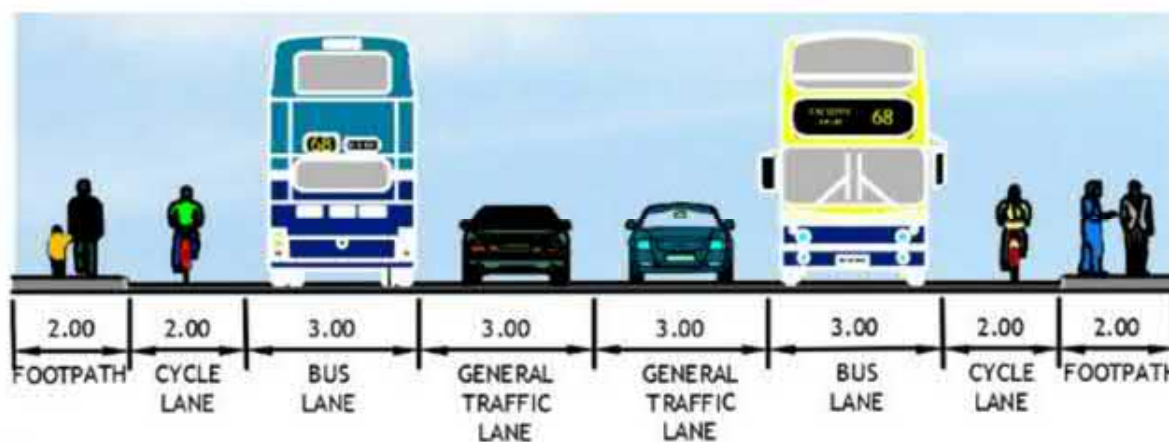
S3-1:1 Cross Section on Walkinstown Avenue
